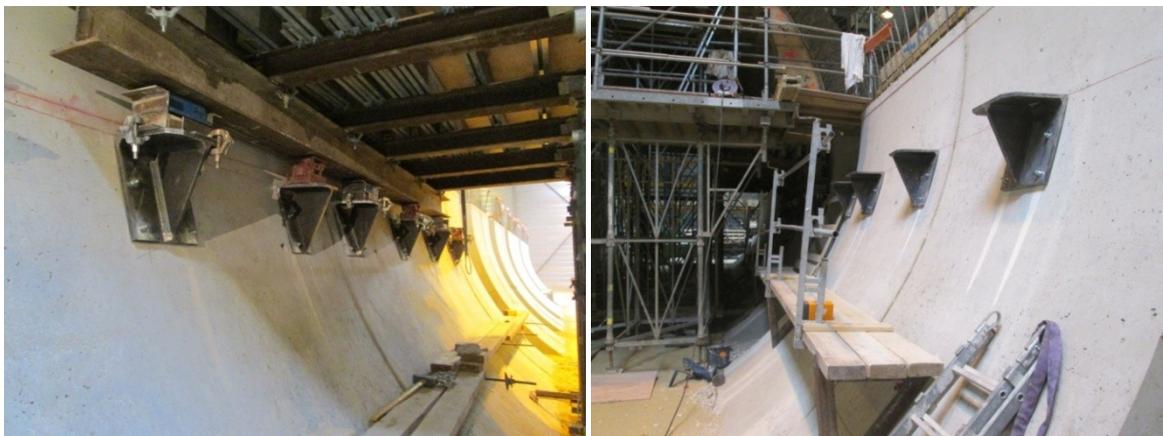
Details of the shoring system c/w jacks, rollers and brackets, used to slide the inner formwork
